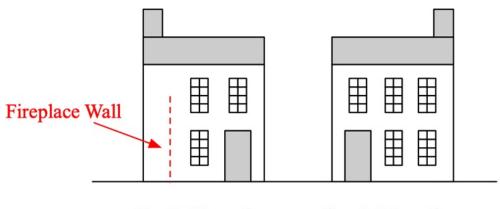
Line drawing of the north and south elevations of the c. 1810 portion of house, showing the location of the fireplace wall.
